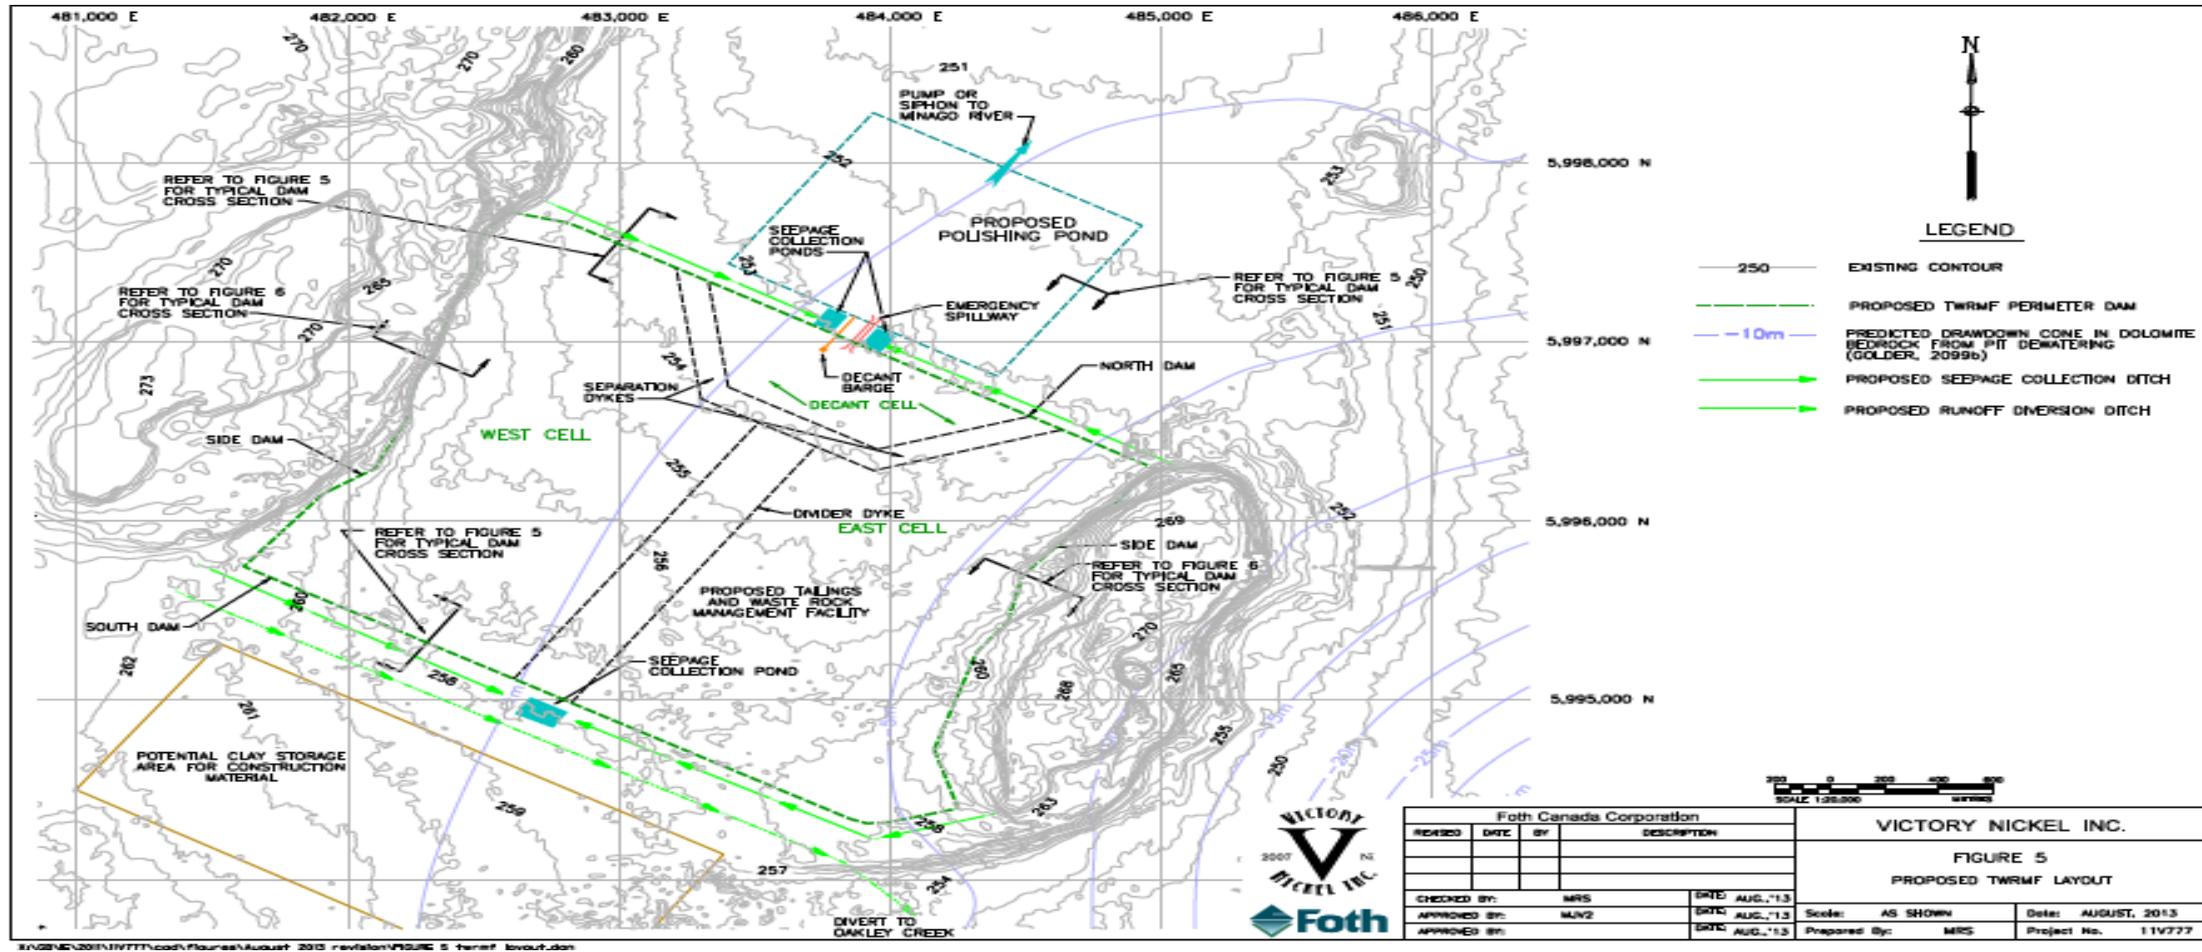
Detailed Layout of the Proposed TWRMF
